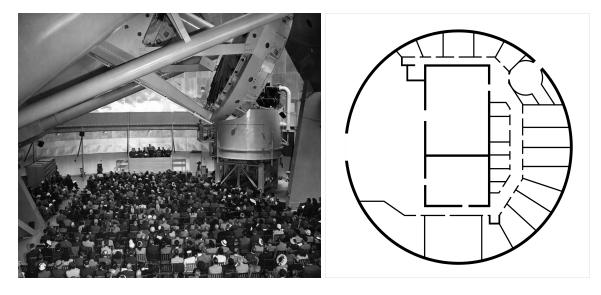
Left: The Hale Telescope inauguration. Right: Hale Telescope plan. Adapted from Castro Tirado (2019).
